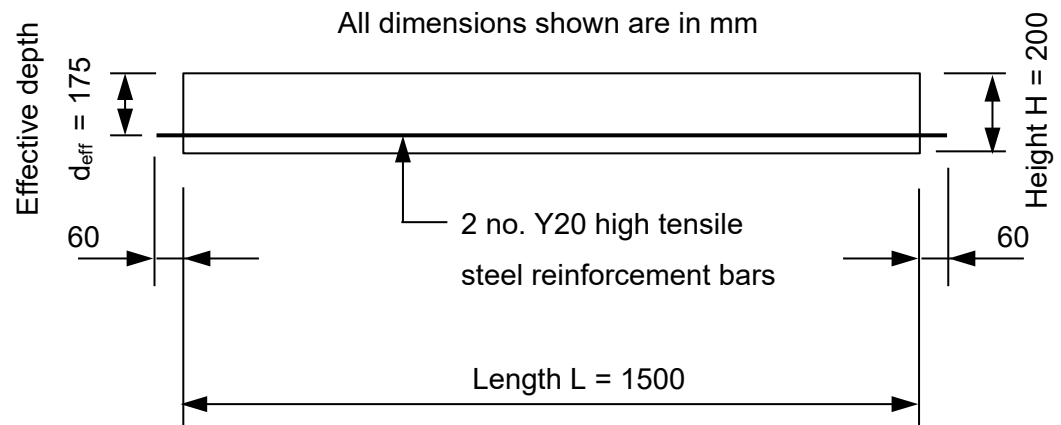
Elevation – dimensions of the reinforced concrete beams
